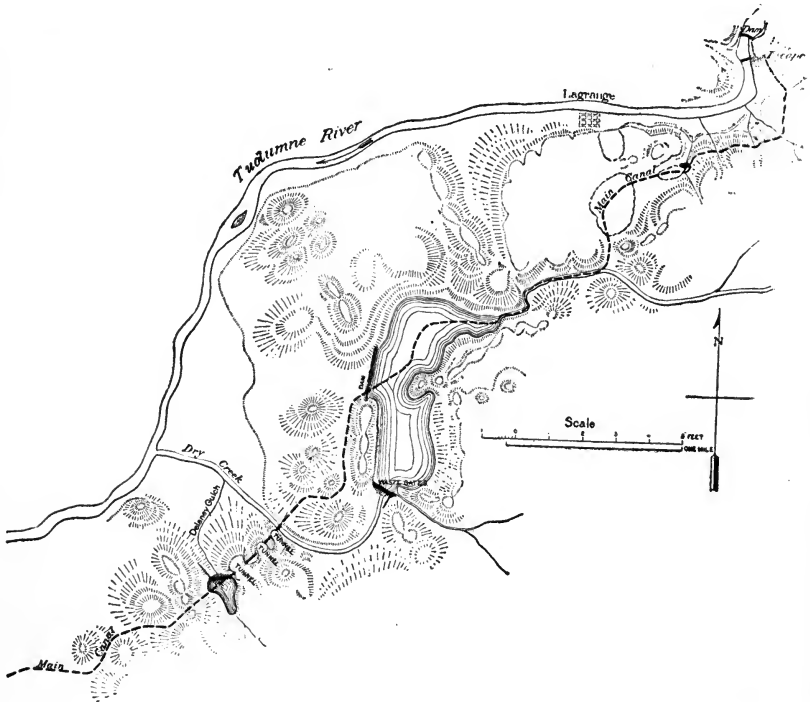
TURLOCK CANAL. PLAN OF DIVERSION LINE.
